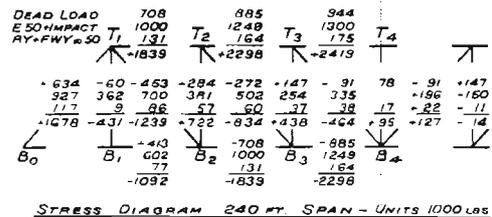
Stress Diagram, 240 ft. Truss.
